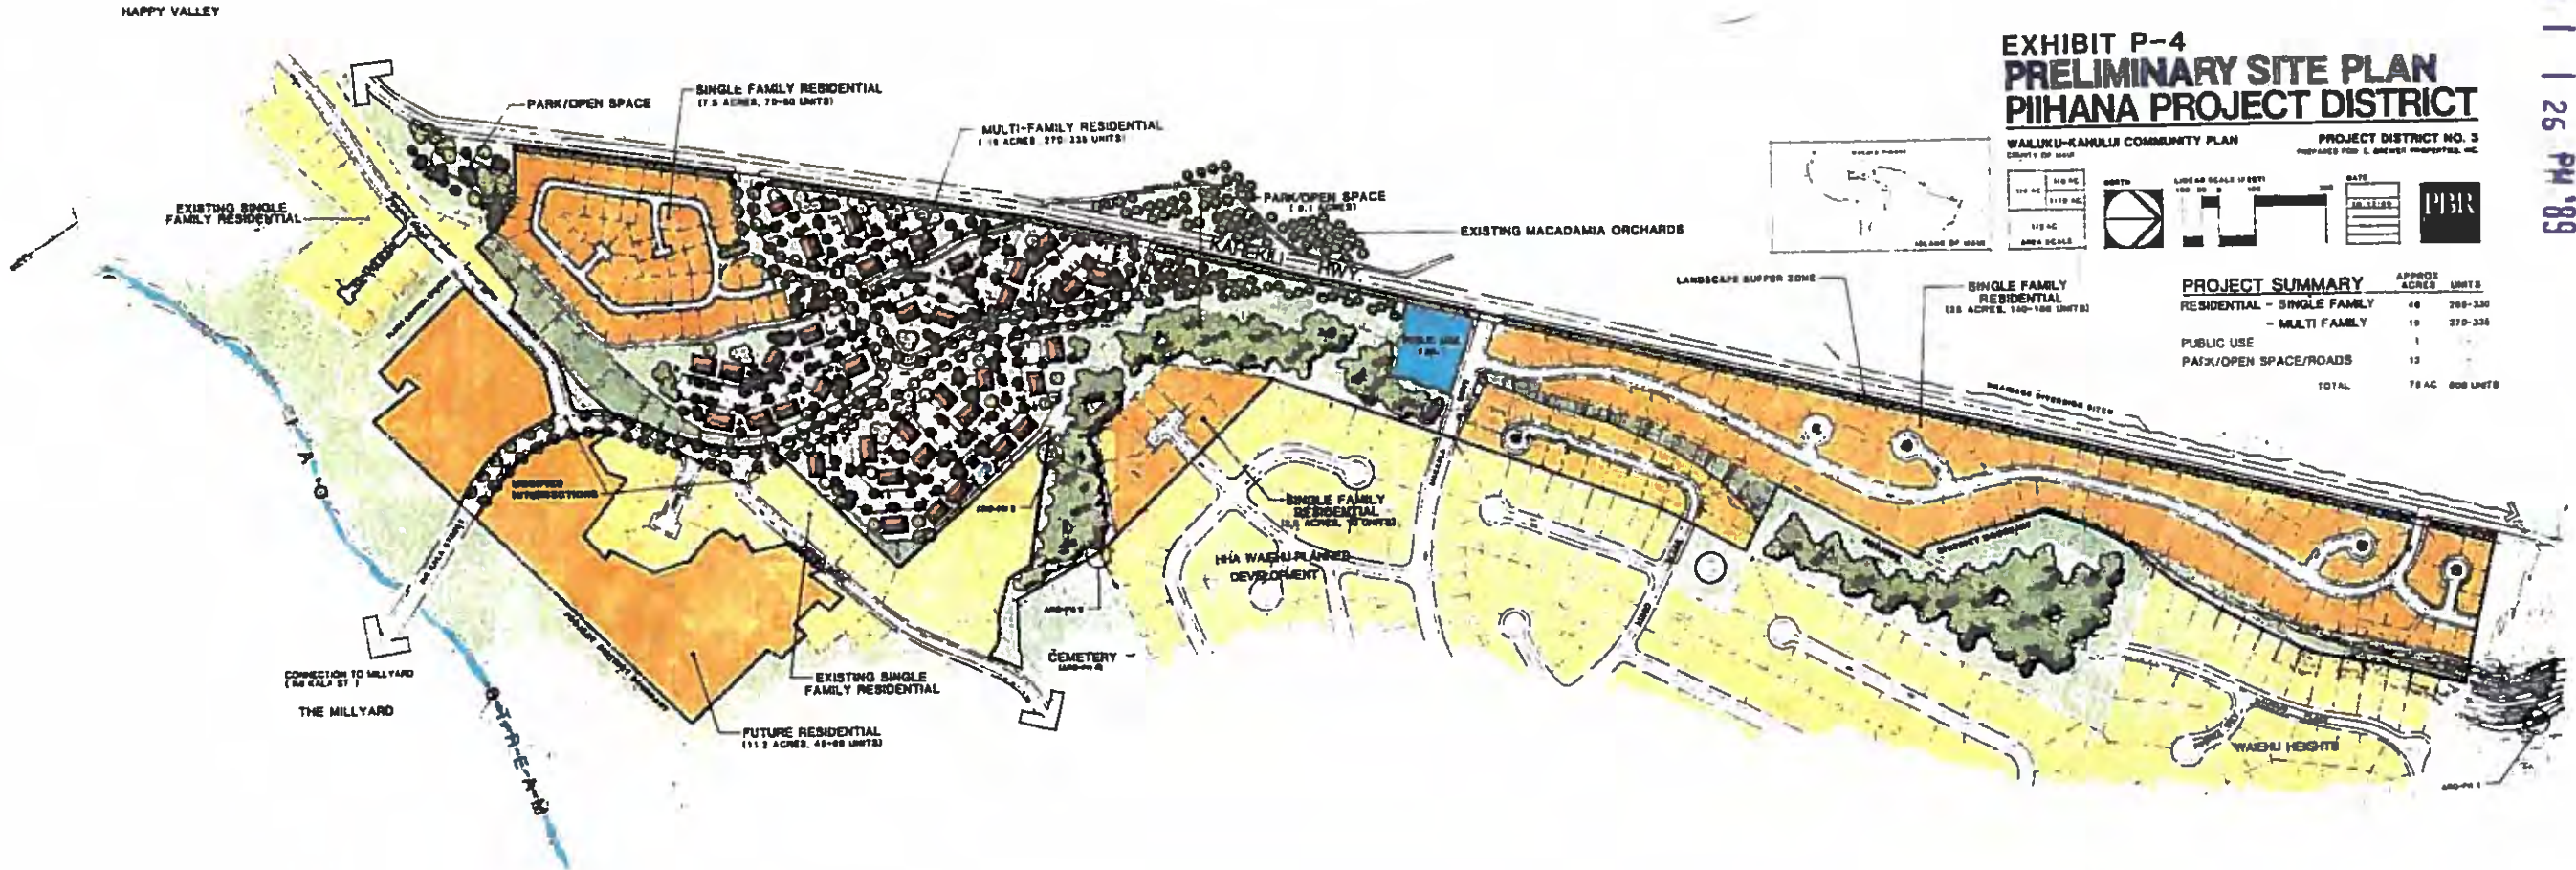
PRELIMINARY SITE PLAN PIIHANA PROJECT DISTRICT
